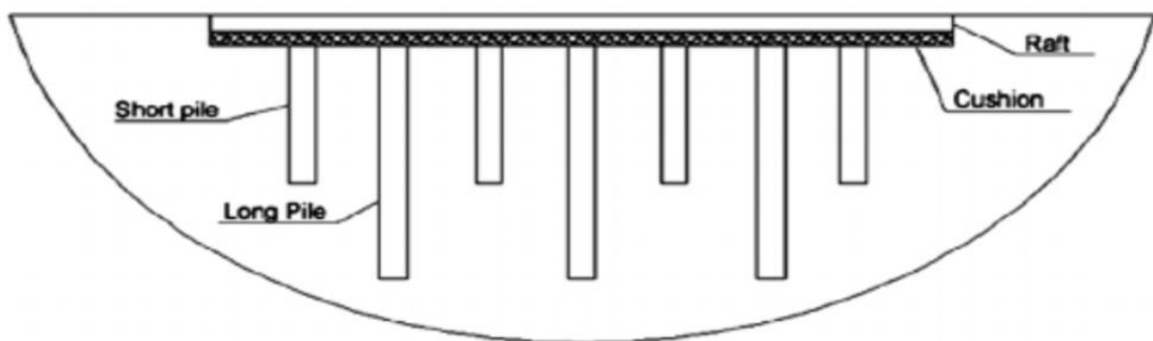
Piled raft foundation (V.J. Sharma et. al. 2015 [3])
